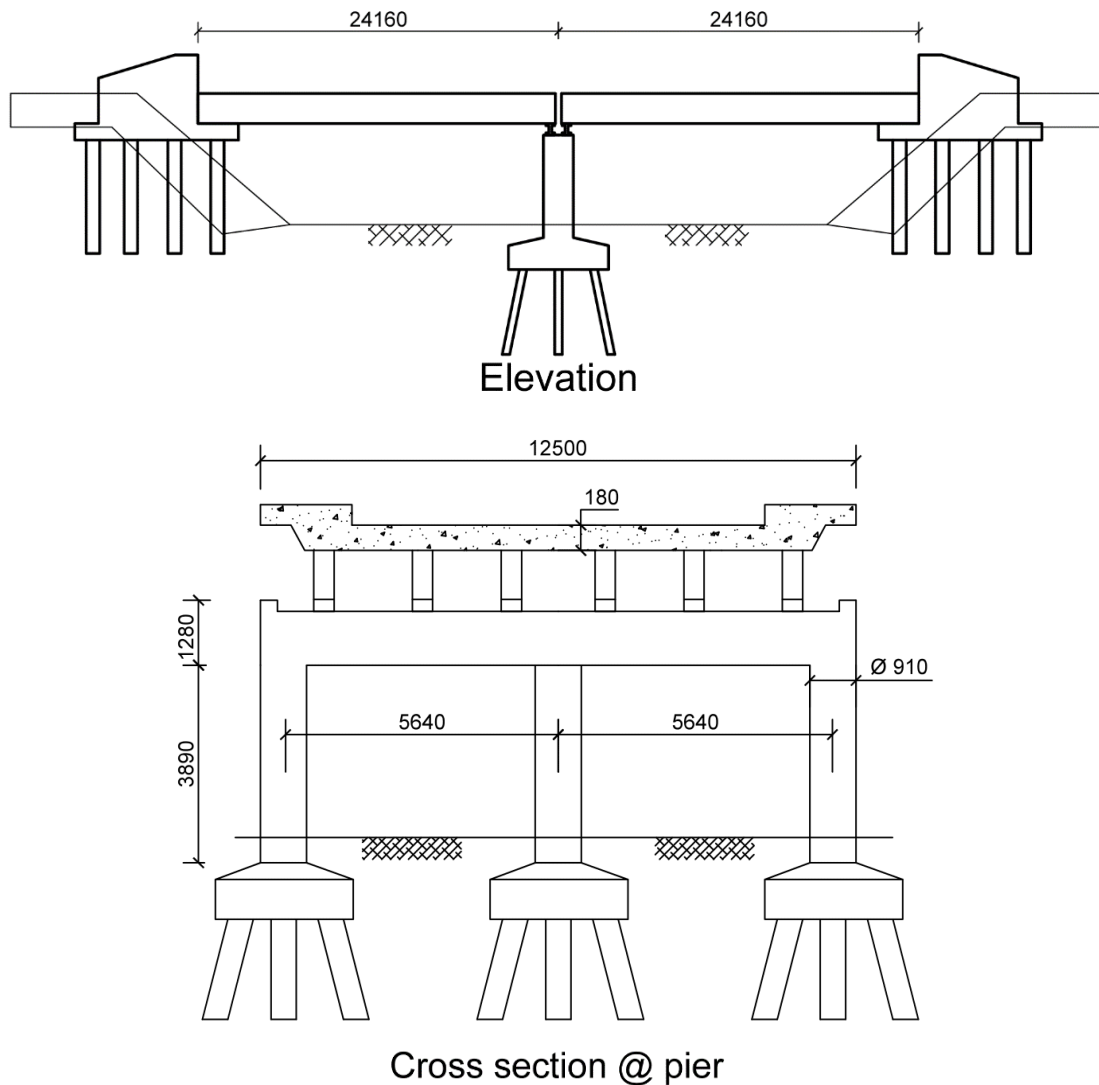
Geometric configuration of Bridge #2 adapted from Keivani (2003).
